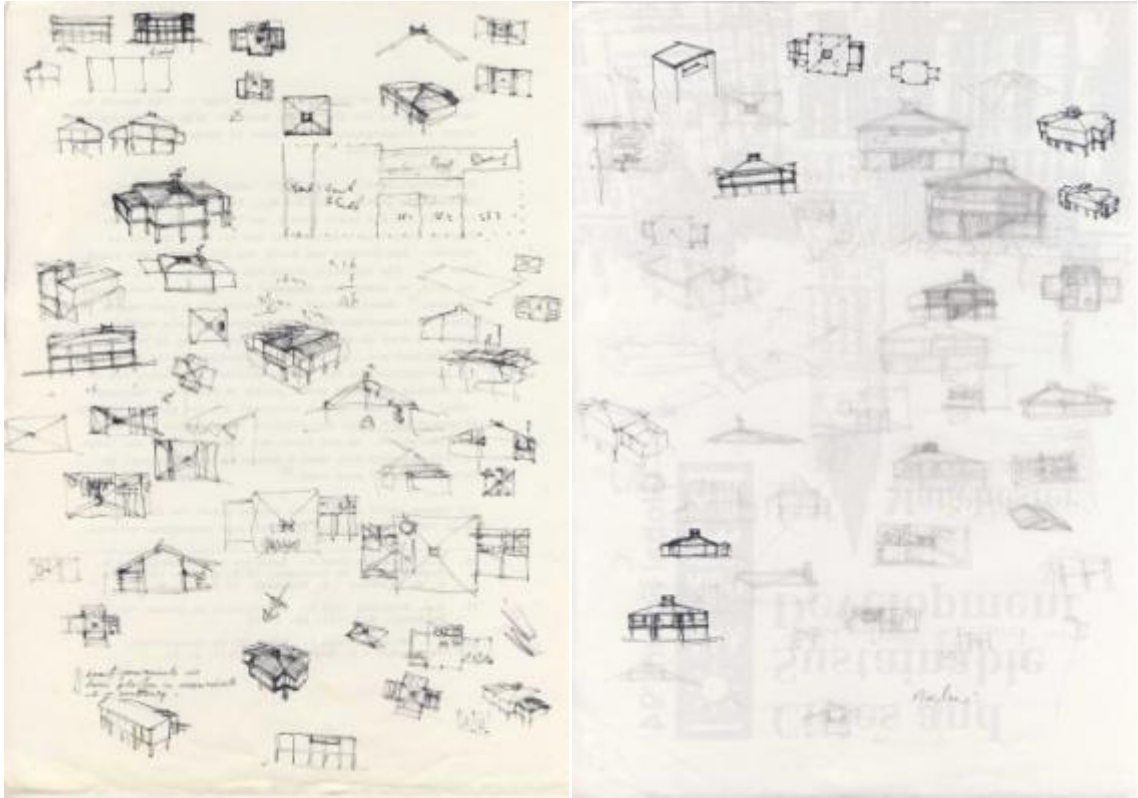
Fagan's ink thumbnail sketches on 2 A4 pages for House Beyers (1998) (Fagan archive - Job. No. 9813, undated).
